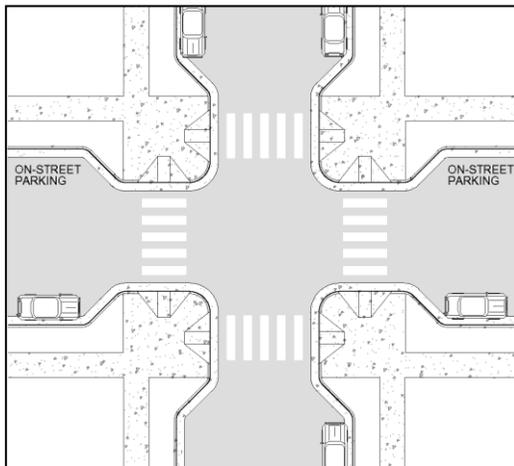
Curb extensions can be used to reduce pedestrian crossing distance at intersections and at mid-block crosswalks.
